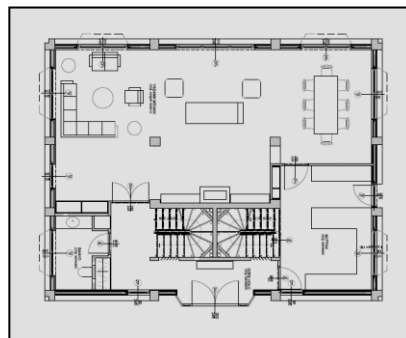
Floor plan of G. Çağlayan villas [164] (t)
